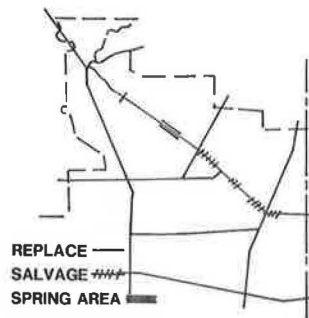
Location of salvage sections, replacement sections, and spring area.
